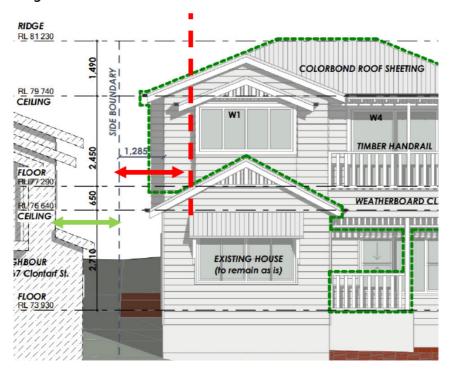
Source: <u>Manly Development Control Plan</u> 4.1.4.2 Side setbacks and secondary street frontages (a) – Setback calculation guidance (note, southern wall height noted in image 1.1 does not capture from ground height)
